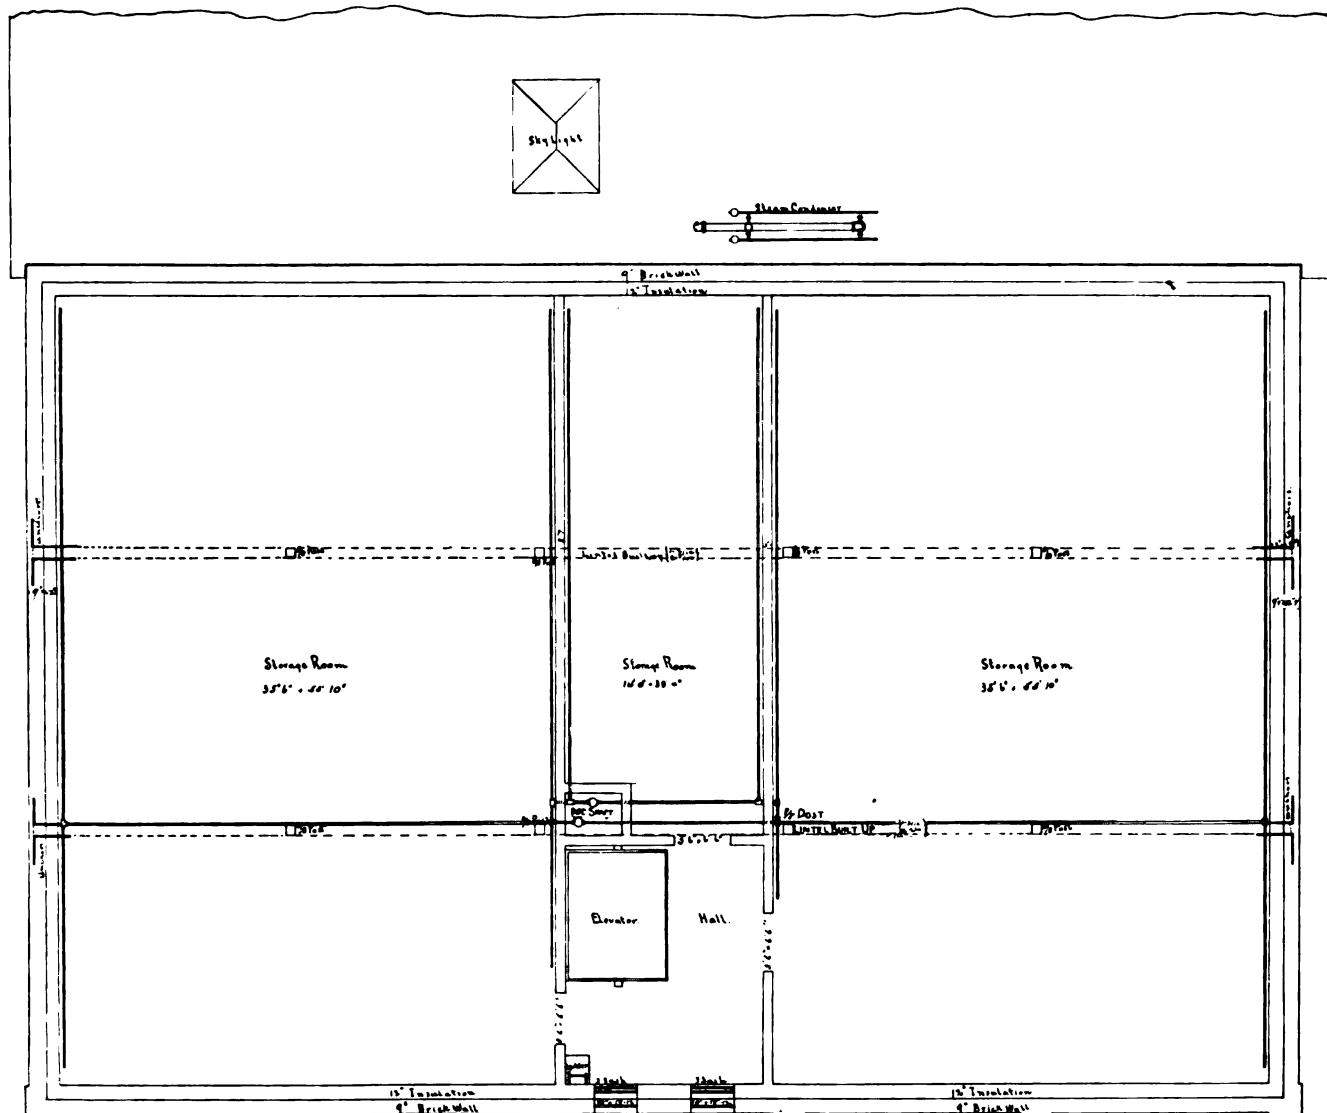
THIRD FLOOR PLAN, TOLEDO COLD STORAGE CO.'S NEW WAREHOUSE, TOLEDO, OHIO.
